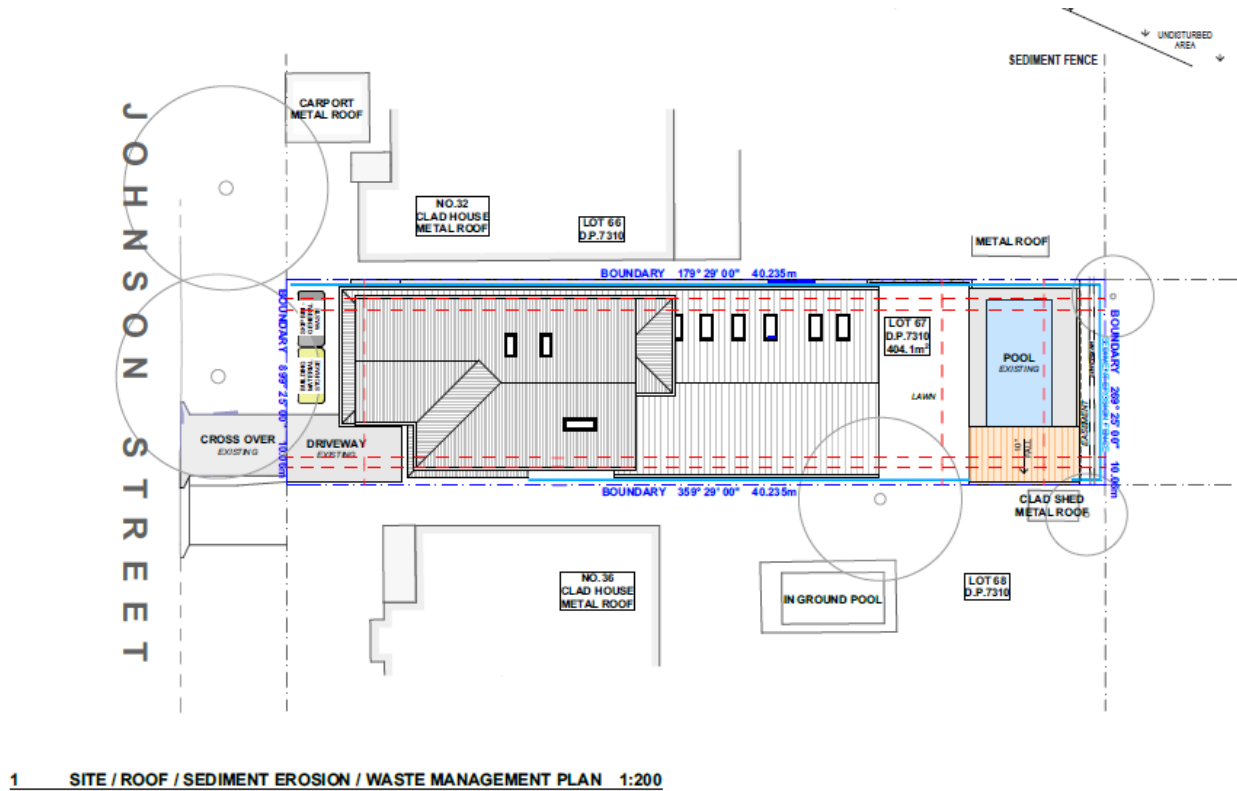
Site Plan showing proposed new cabana and pergola structure (Action Plans, 2025)
